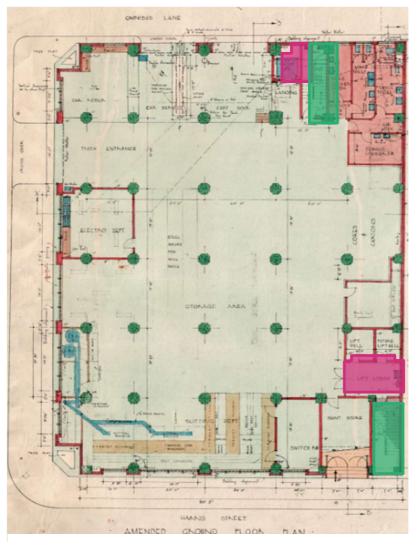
Original Ground Floor plan showing location of lift wells (pink) and stair cores (green).
